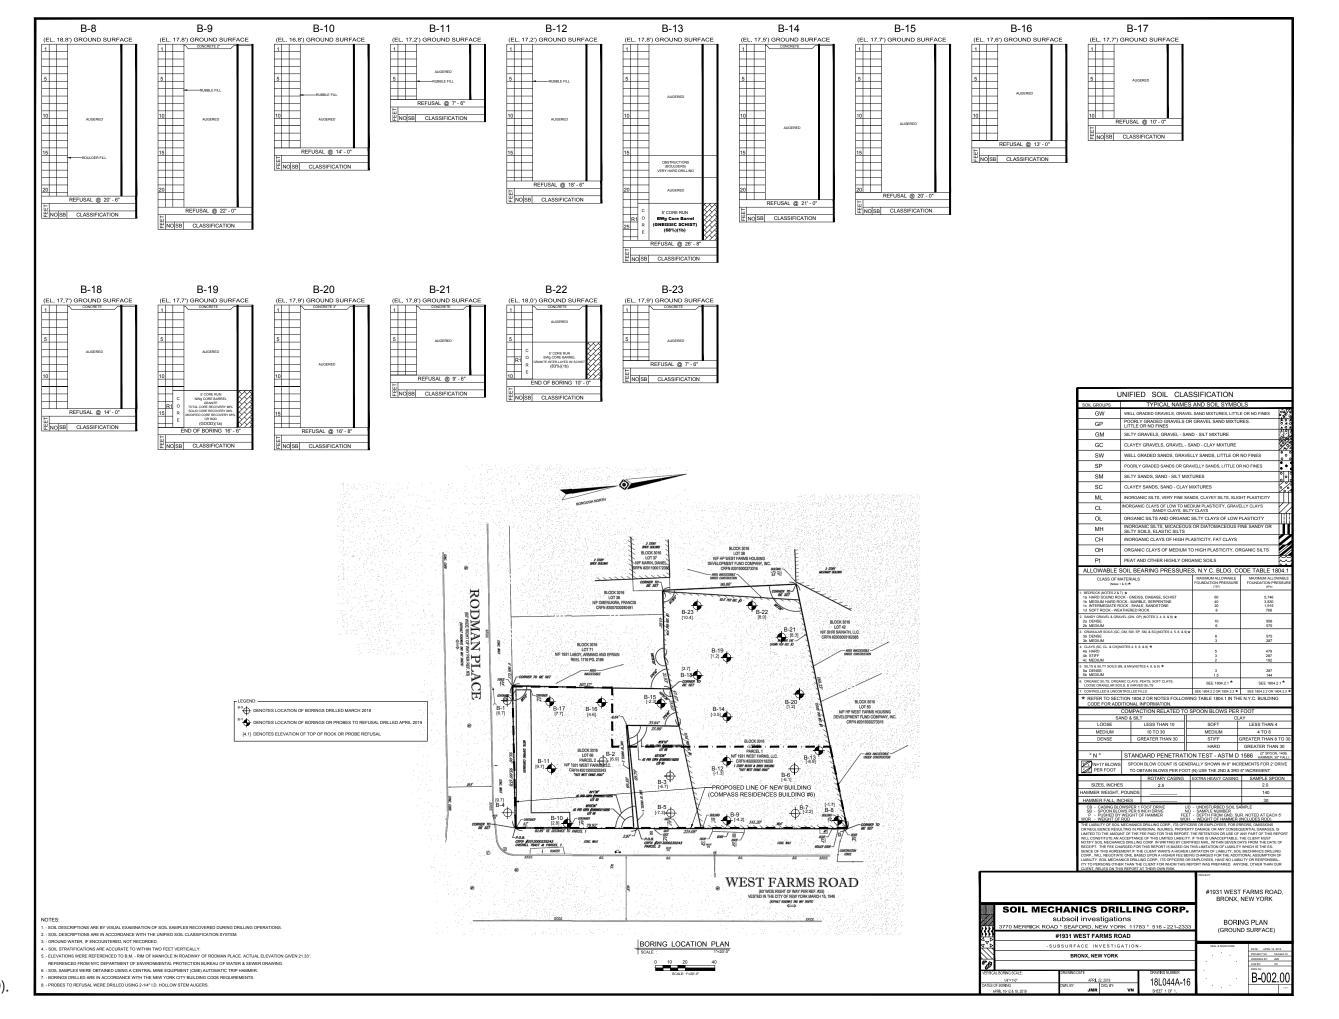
Soil Boring Location Plan (Soil Mechanics Drilling Corp, 2019).
